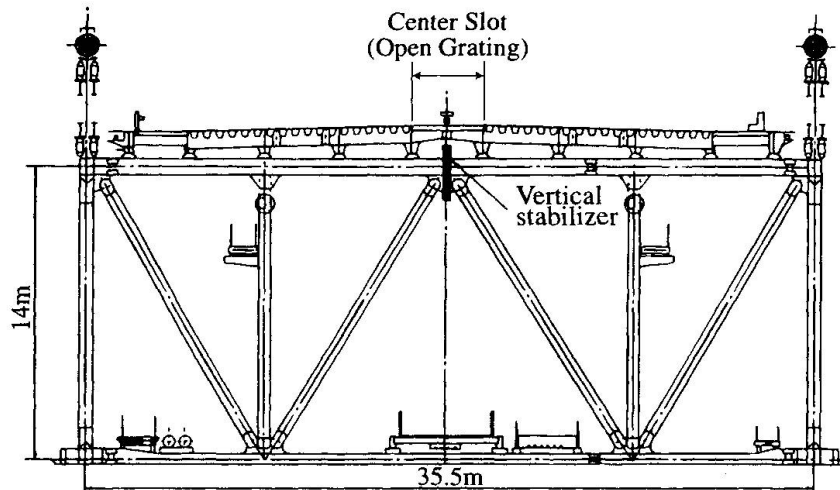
The Vertical Stabilizer of the Akashi-Kaikyo Bridge in the center span
